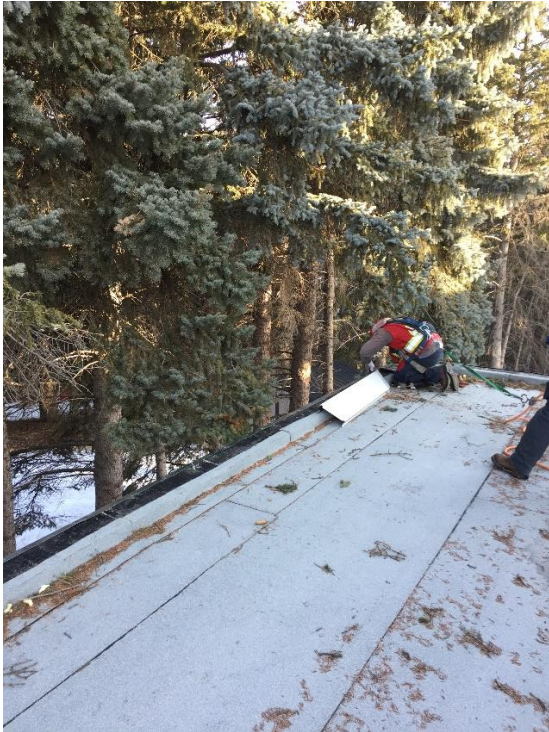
A Field Installer measuring flashing to ensure it will fit accurately on the corner of the parapet.
